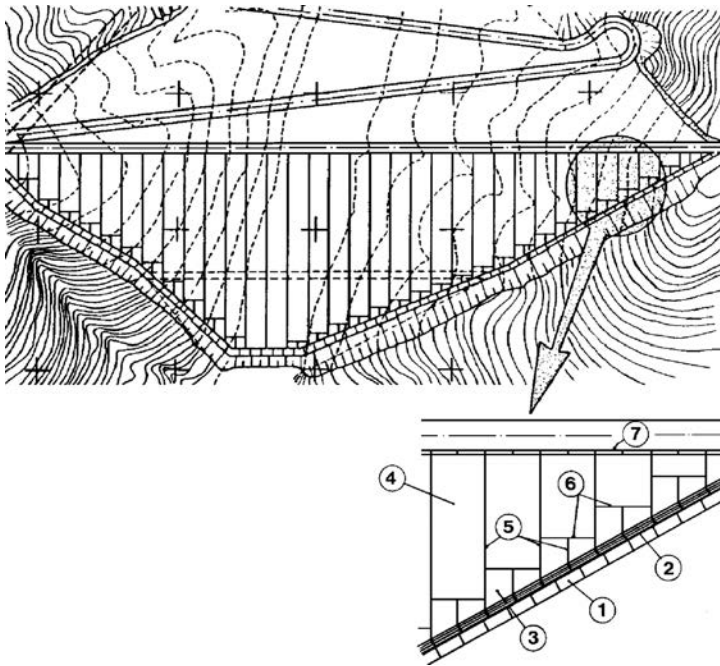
Layout plan of modern construction of reinforced concrete facing with a detail containing denoted elements of the facing. (1) Concrete plinth (toe slab); (2) perimeter joint; (3) initial facing slabs with irregular form; (4) slabs of facing with vertical spreading; (5, 6); joints (7) parapet wall at the crest of the dam.
